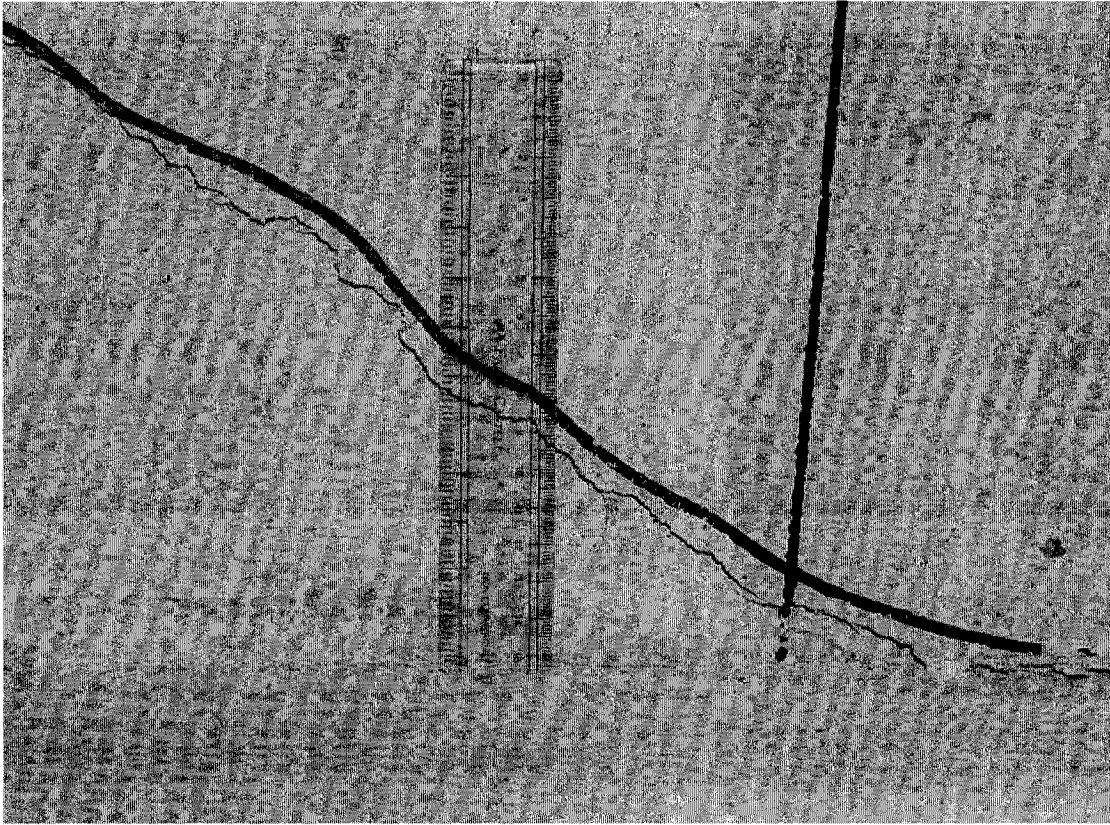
Close up view of girder IT-G3R at failure
